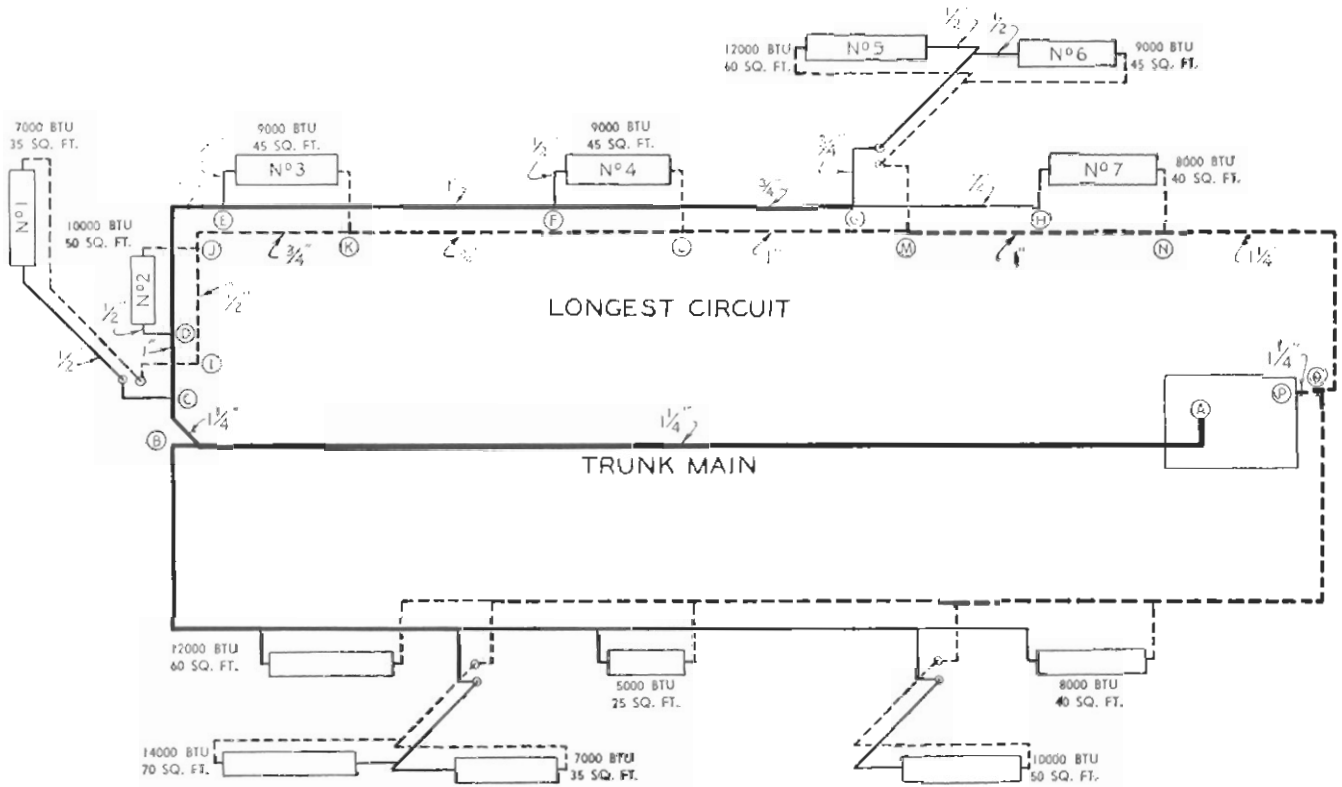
Example of two-pipe reverse return forced hot water system piping layout.
